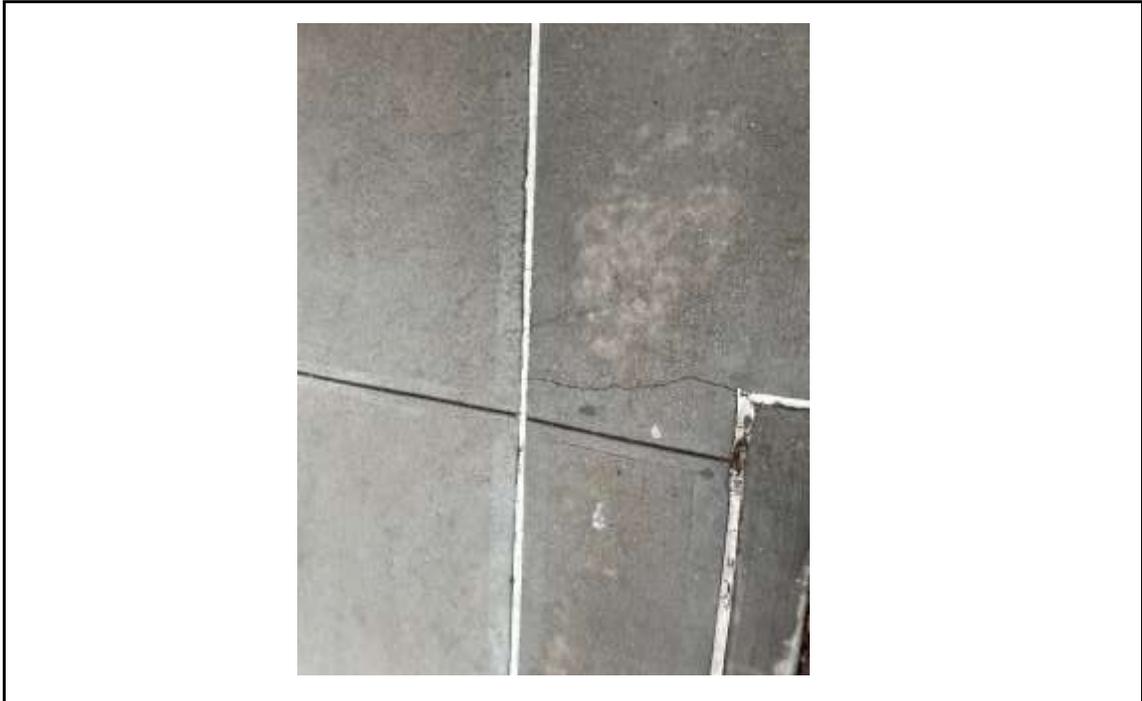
Typical hairline/surficial crack observed, facing north. Cracks did not breach to the subsurface. 02 March 2023.
